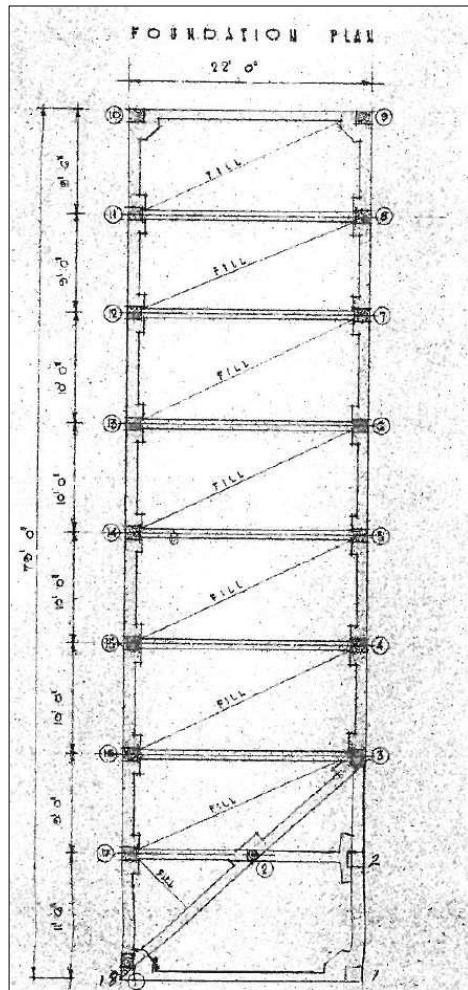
Bradley's Building Foundation Plan, March 1955. Source: WC Archives 00056:508:B38052
